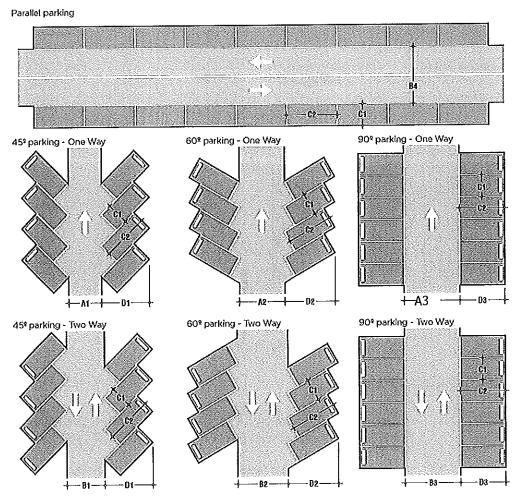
Parking Lot Stall, Aisle and Parking Bay Dimensions
